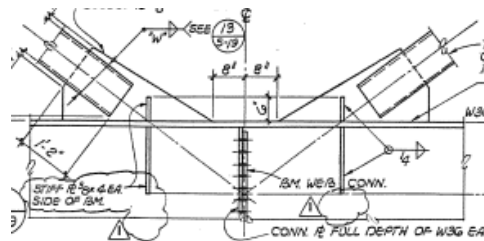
Bottom Connection Detail (80CA4A--2-AB-2)
